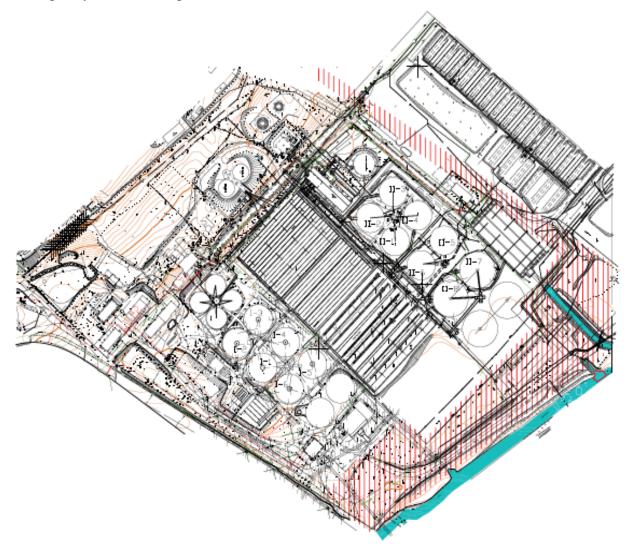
General layout of Chisinau Wastewater Treatment Plant
